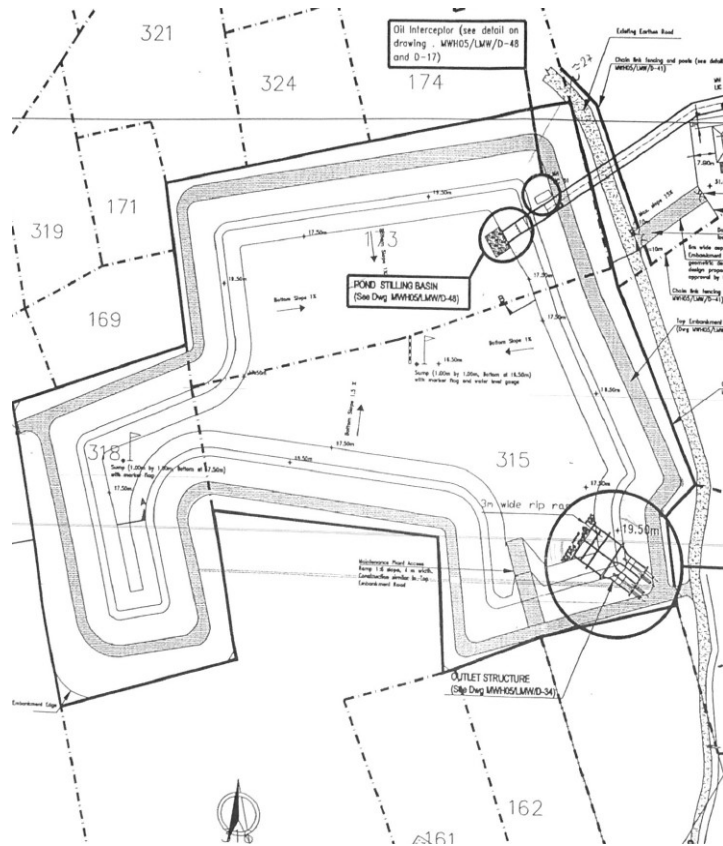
The construction site - a plan view construction drawing. The east road was studied for the purposes of this research.
